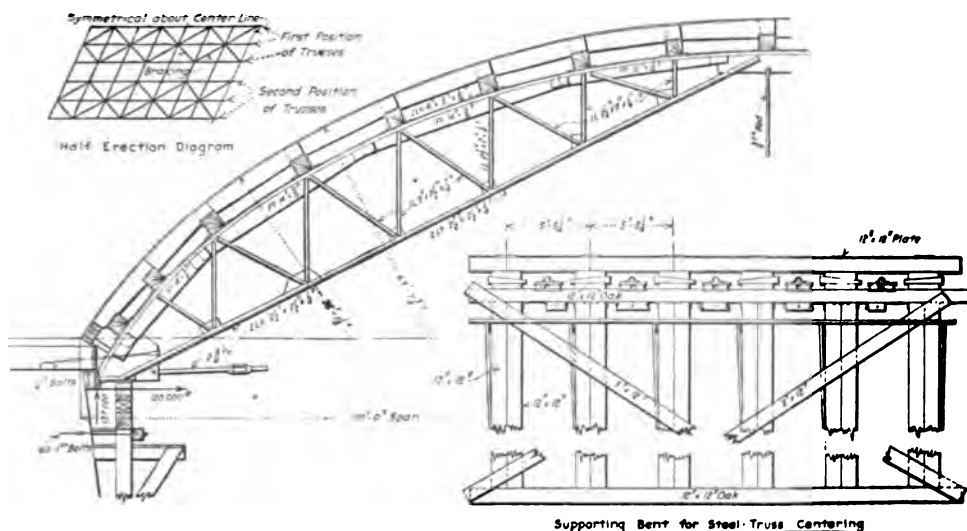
Steel centering for Atherton Avenue bridge, Pittsburgh, Pa.
